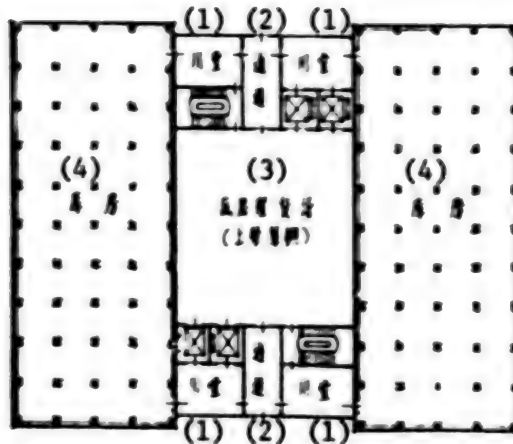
"Separate" Type Warehouse, Elevator Is Centrally Located Outside the Warehouse (2)
